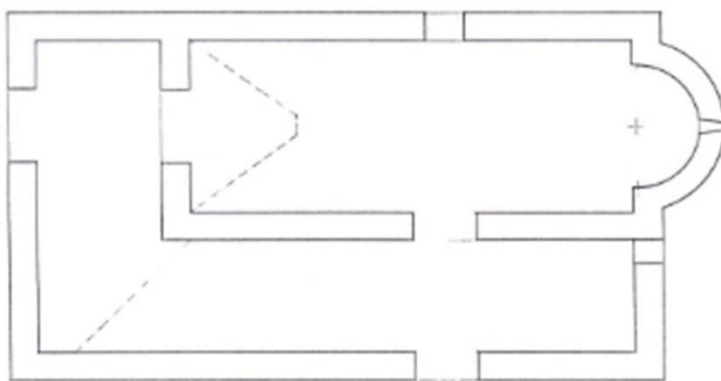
Plan of a single-aisle church with corridors on two sides
